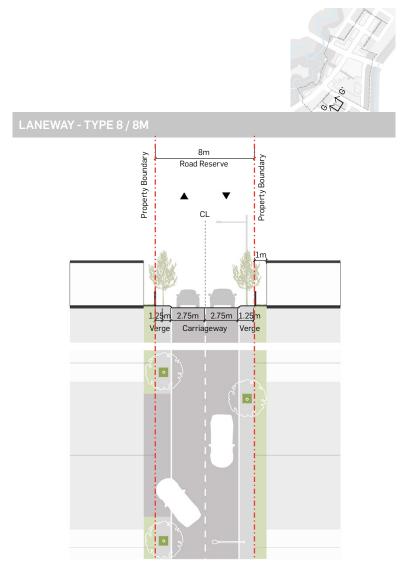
Indicative Street Section G-G' - Laneway - Type 8
